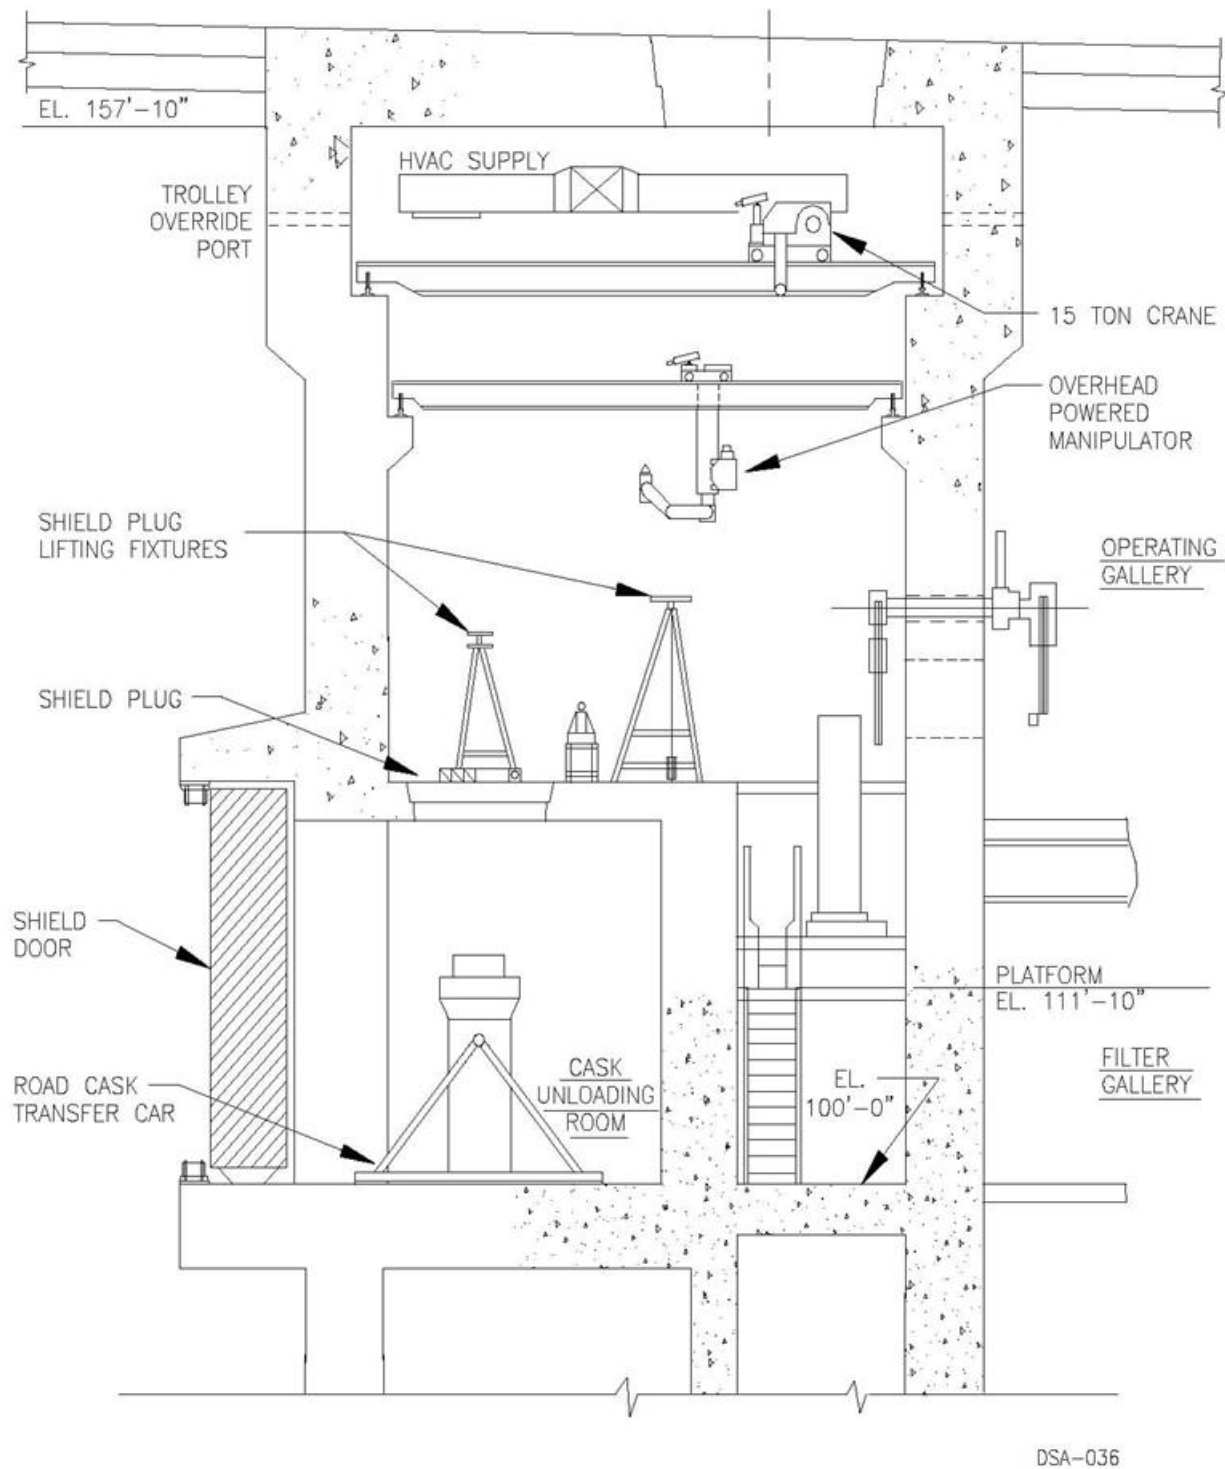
Details of Upper Hot Cell Complex at Cross Section E-E
